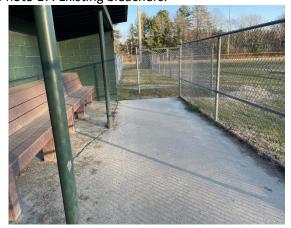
Enclosed dugout with minor cracks in concrete surface.
